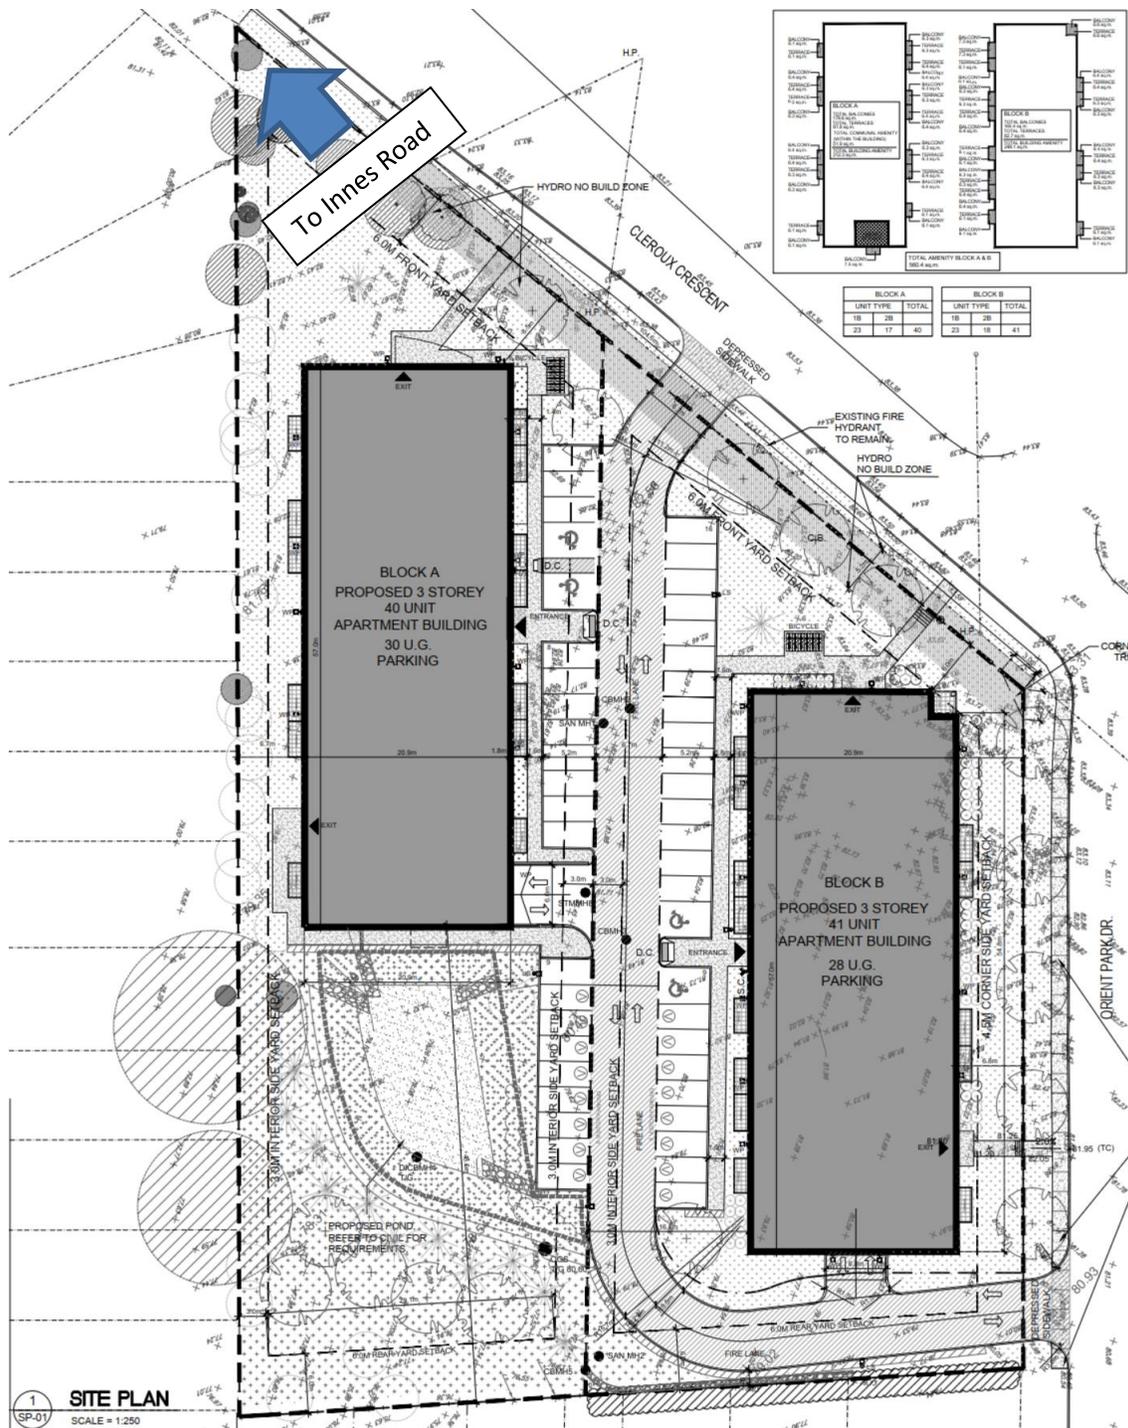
Site plan of 2380 and 2396 Cleroux Crescent.
